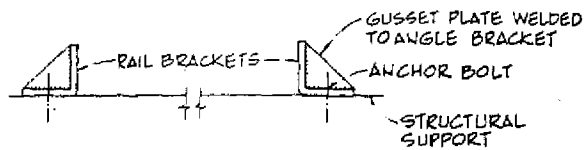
Elevator systems. Counterweight brackets proposed by Ayres and Sun (1973)
